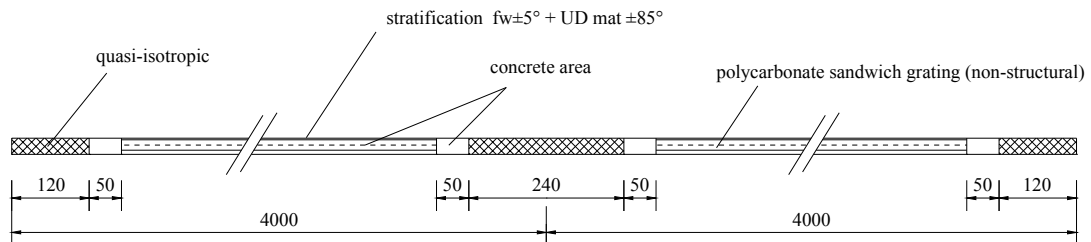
Cross-section of the sandwich shell showing longitudinal and hoop cavities for concrete grouting.
